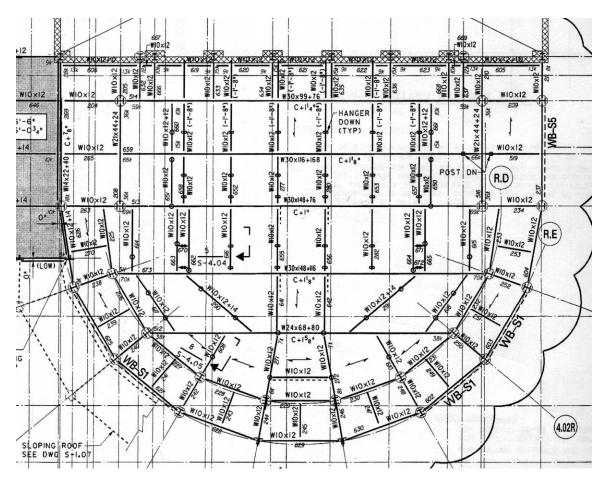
Structural Plan for Location 1 (550 seat main theatre) n.t.s.
